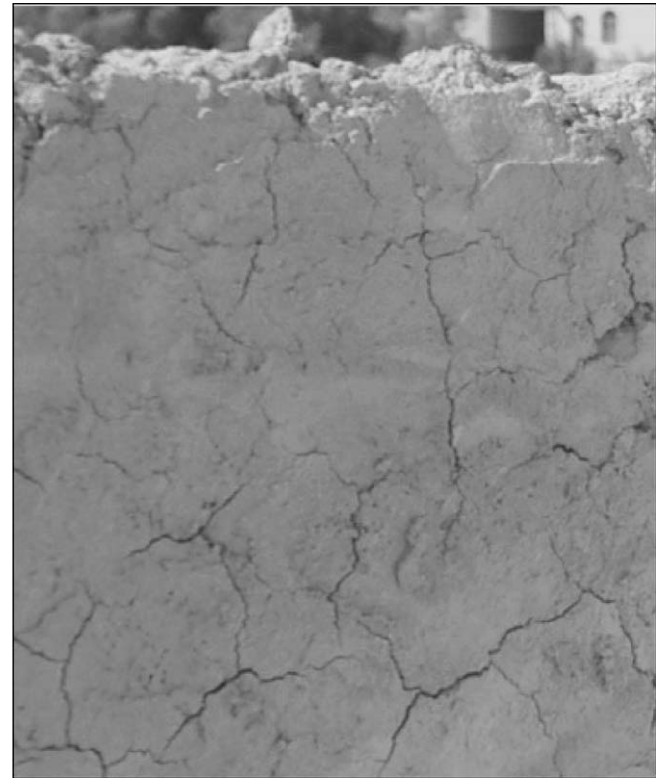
Fissuring phenomena of mortar in a new masonry.
